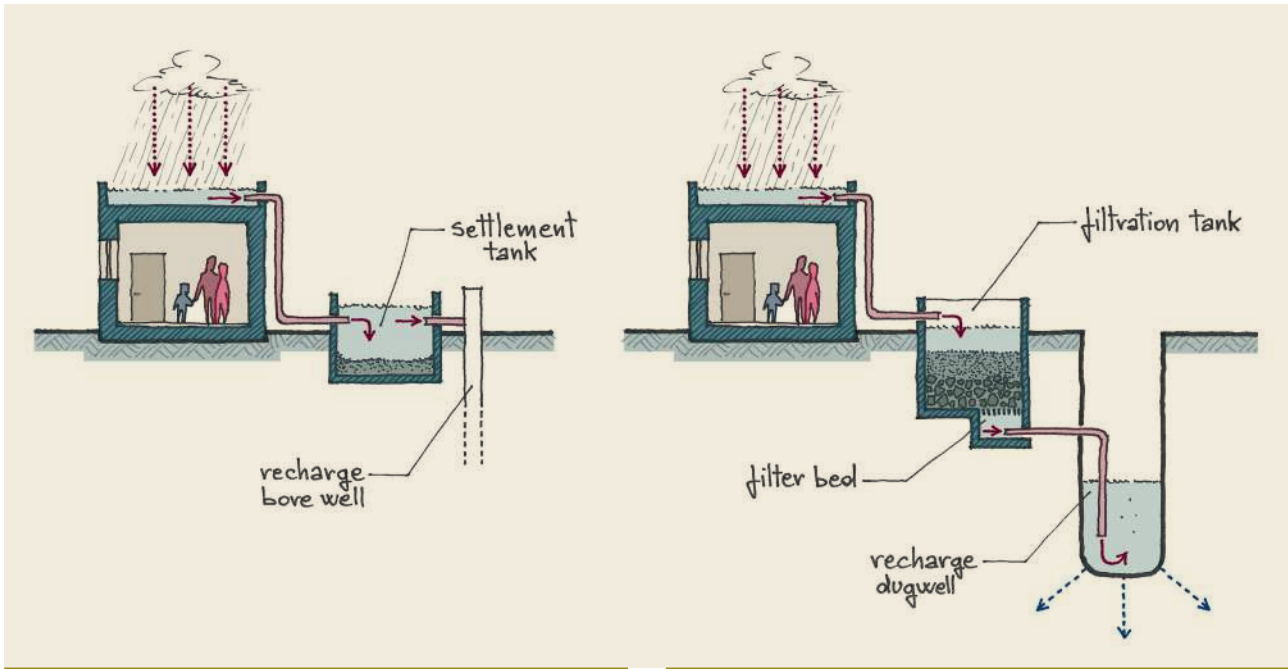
SKETCH OF A RECHARGE PIT
